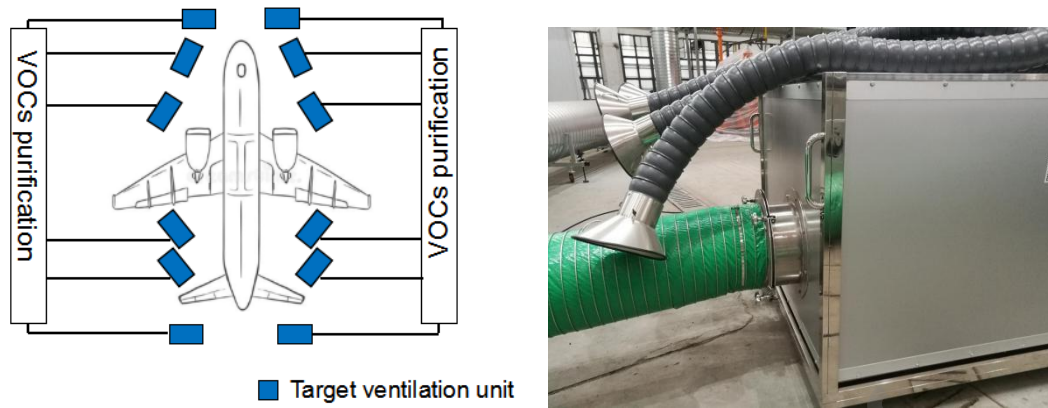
The layout plan and photos of target ventilation units in painting hangar
